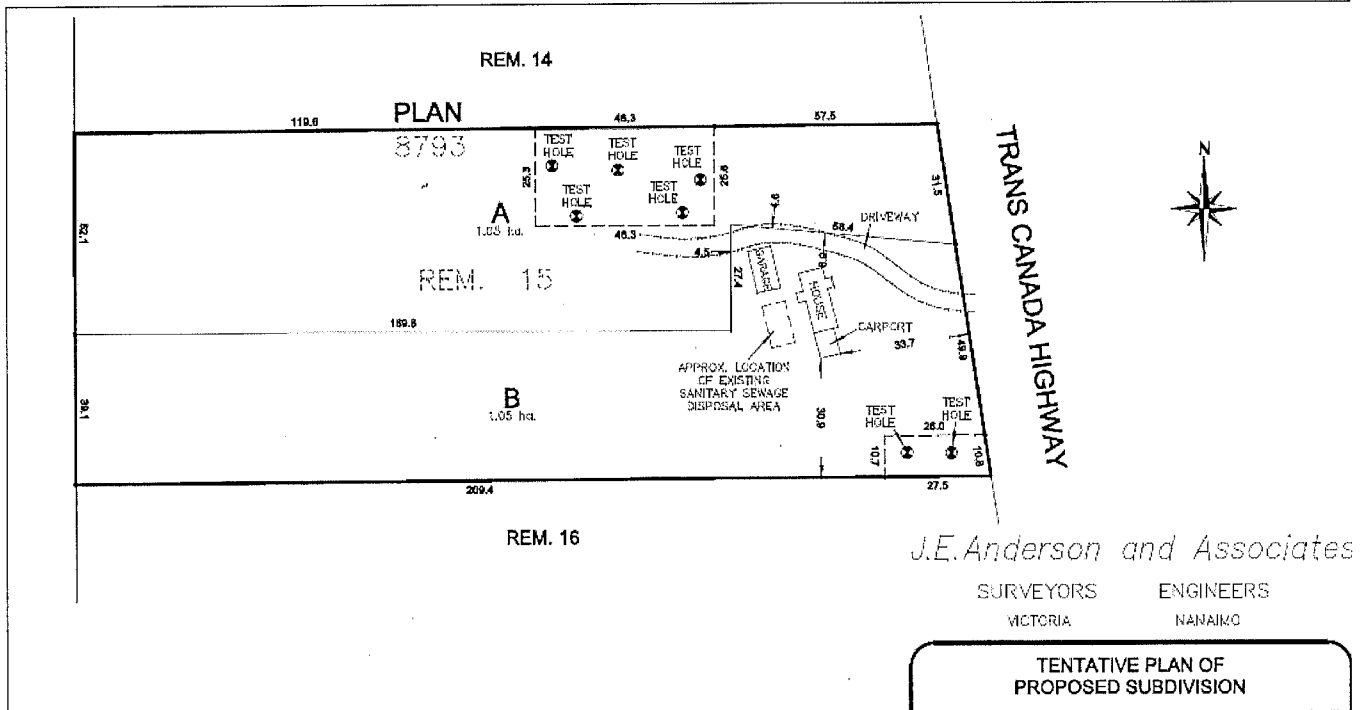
Proposed Subdivision Plan for 10910 Westdowne Road
